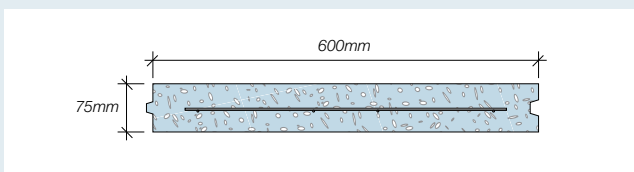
Hebel® PowerFloor™ Panel Cross Section
